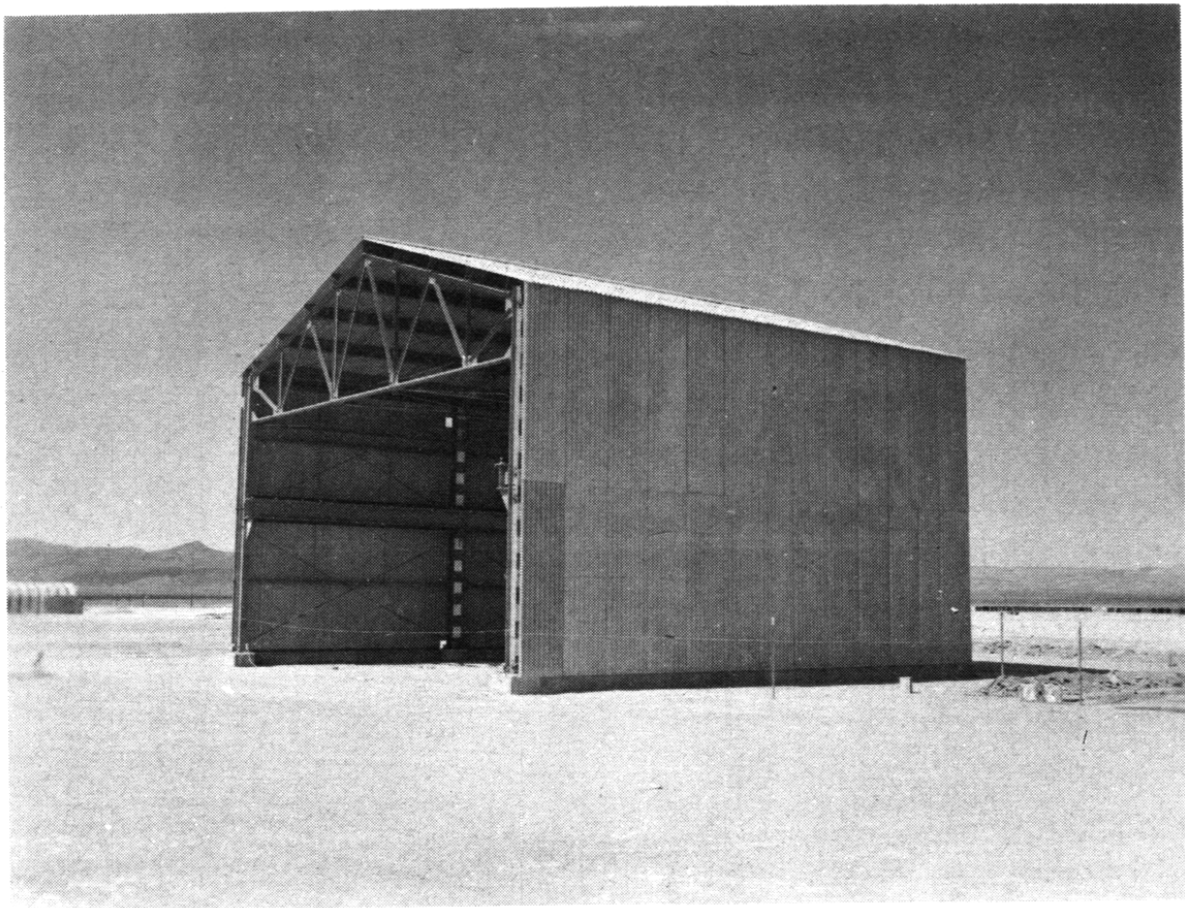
Steel-frame building with siding and roof of frangible material.
